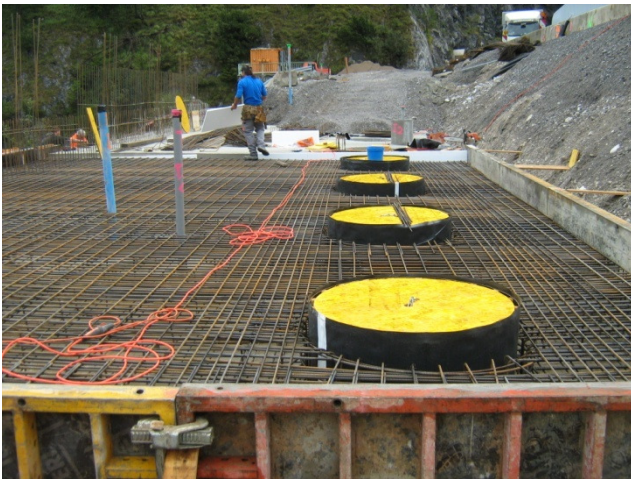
Construction of the bottom slab of the cantilever retaining wall with block-outs for the drainage piles
